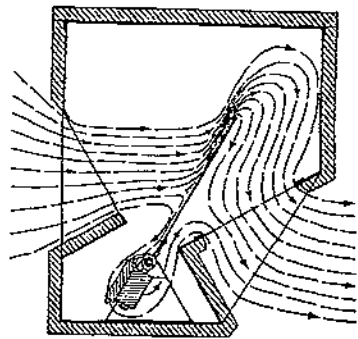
Automatic intake with horizontal-axis type of valve
